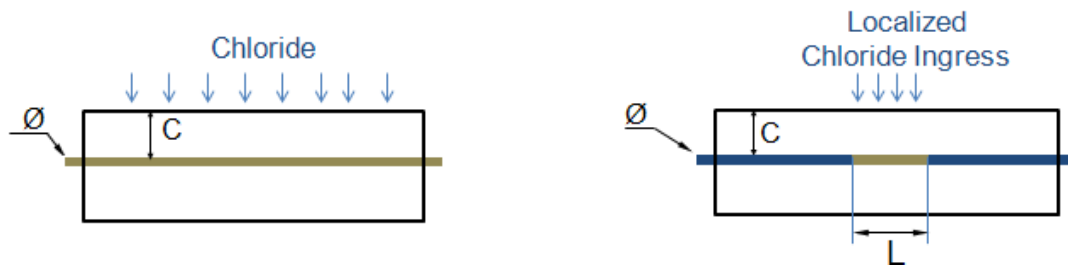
Uniformly and locally corroding reinforcing steel in concrete cylinders
